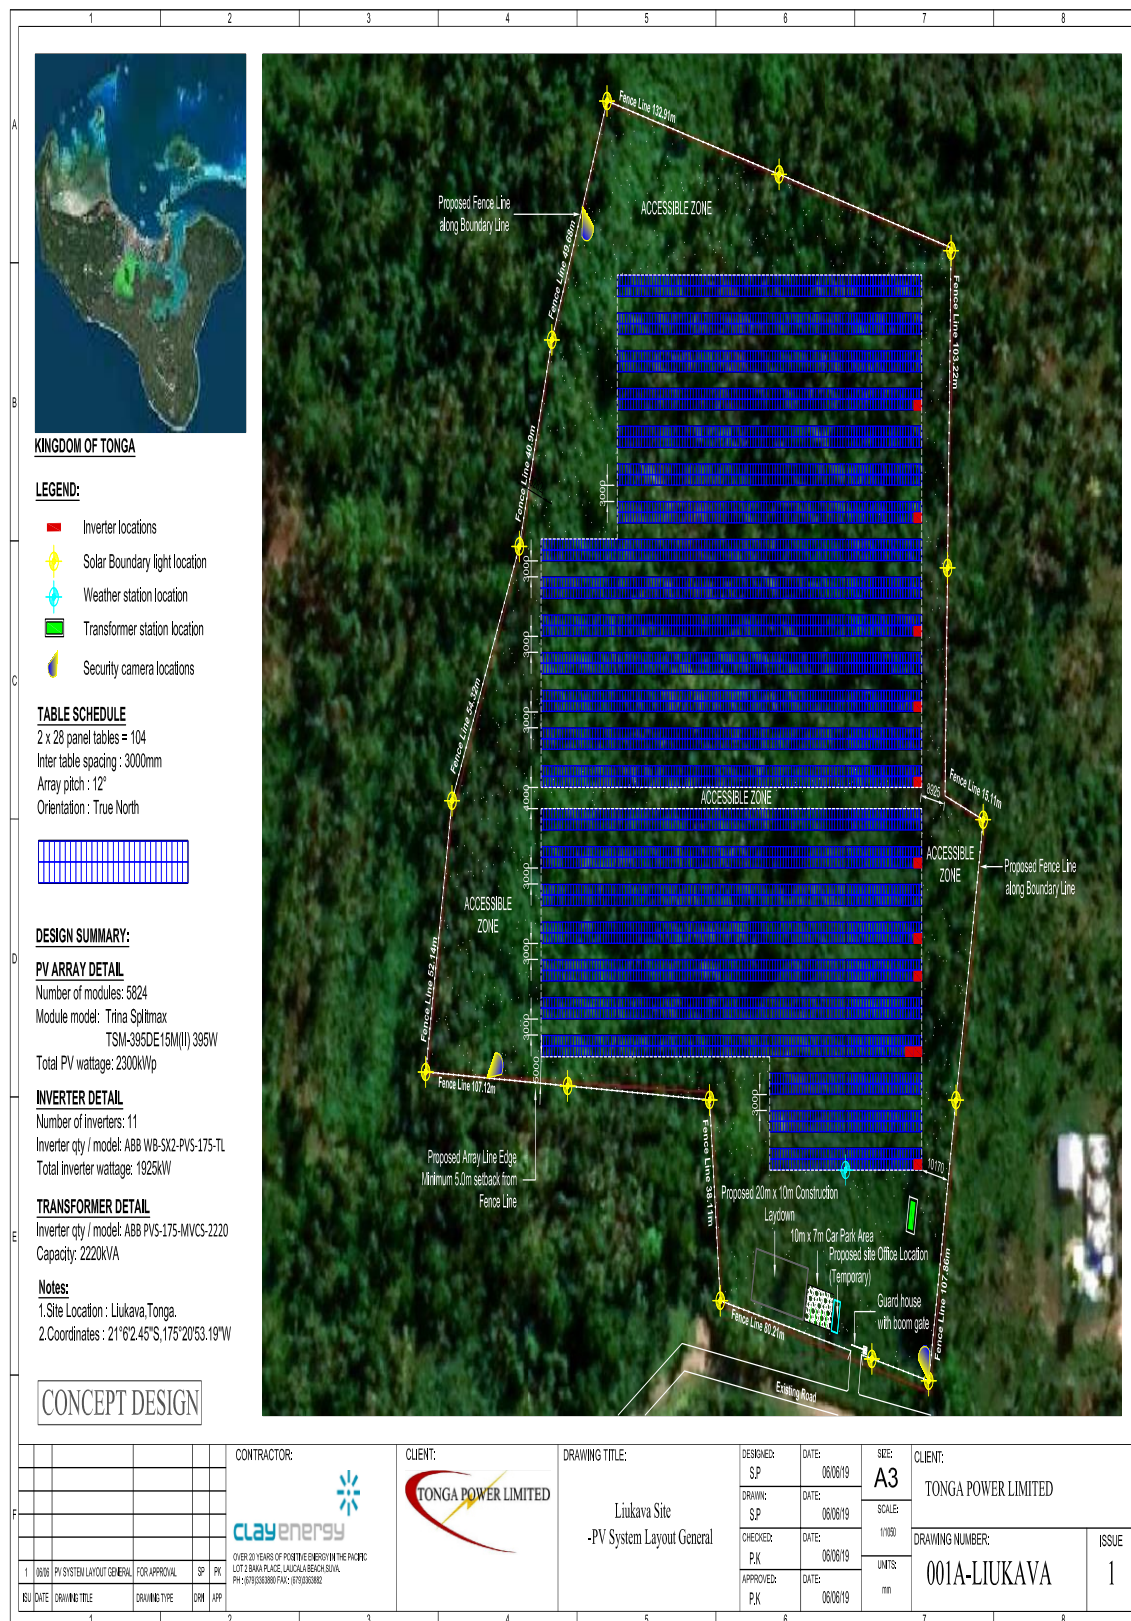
Proposed Layout of Solar Plant at Liukava
